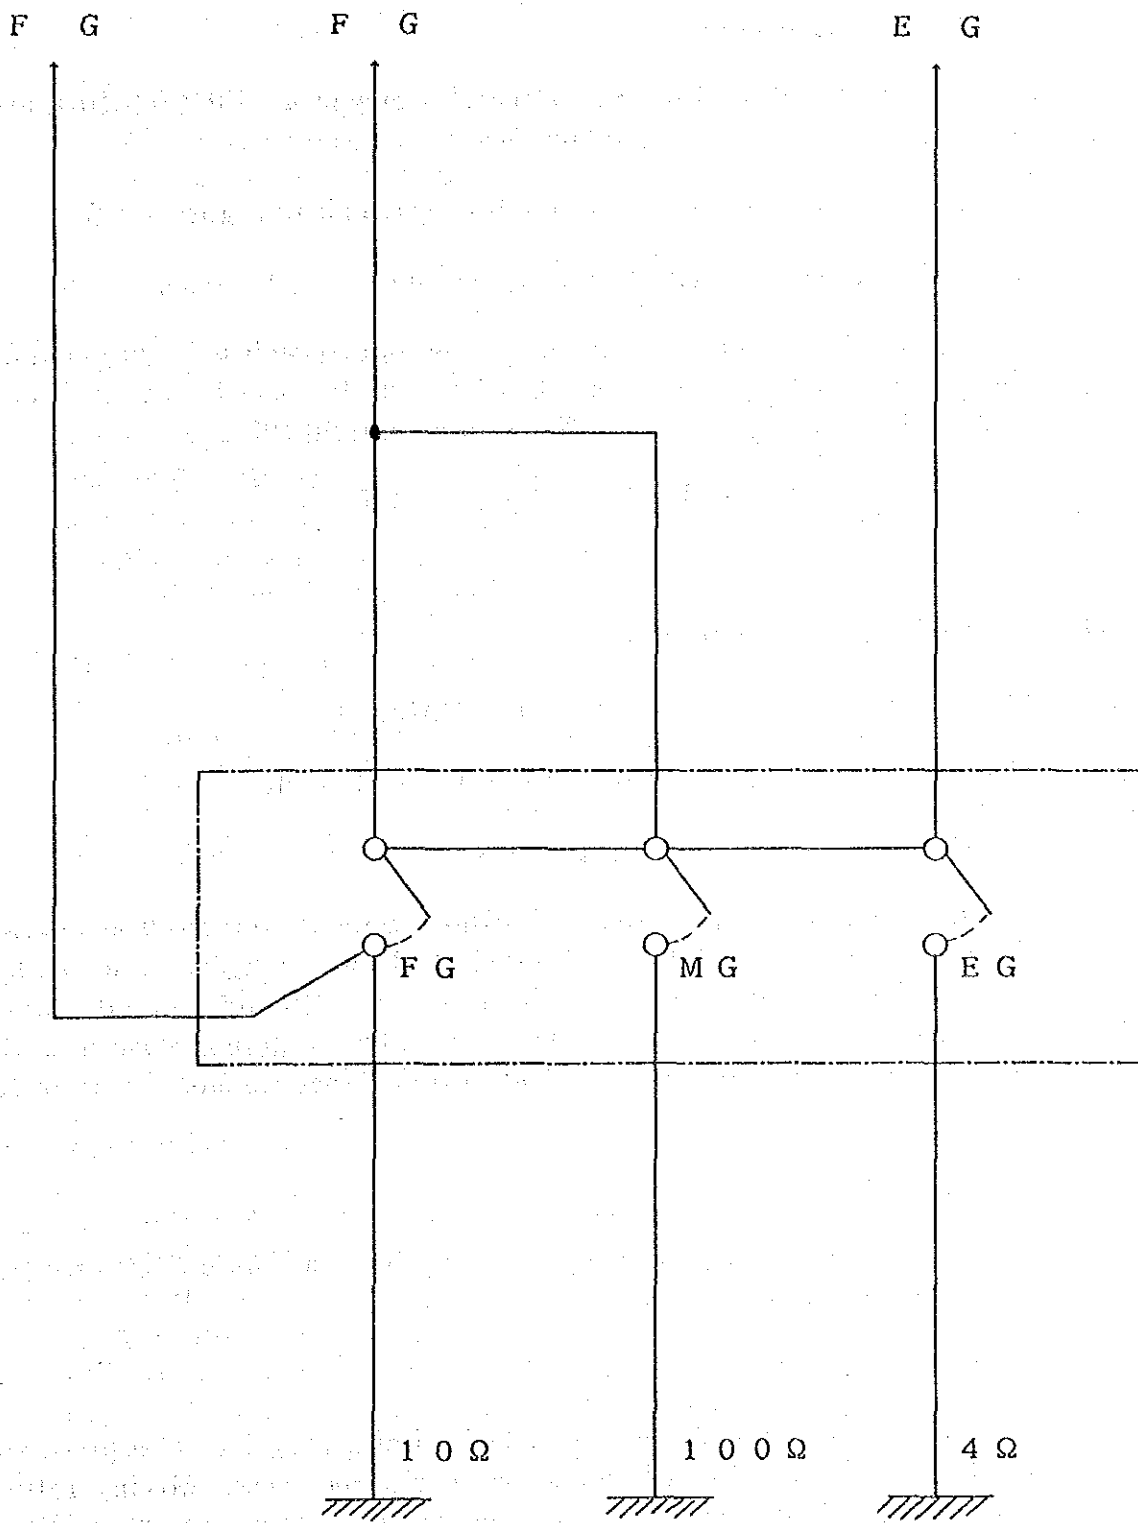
Interface between New Facilities and Existing Facilities in TV Center
